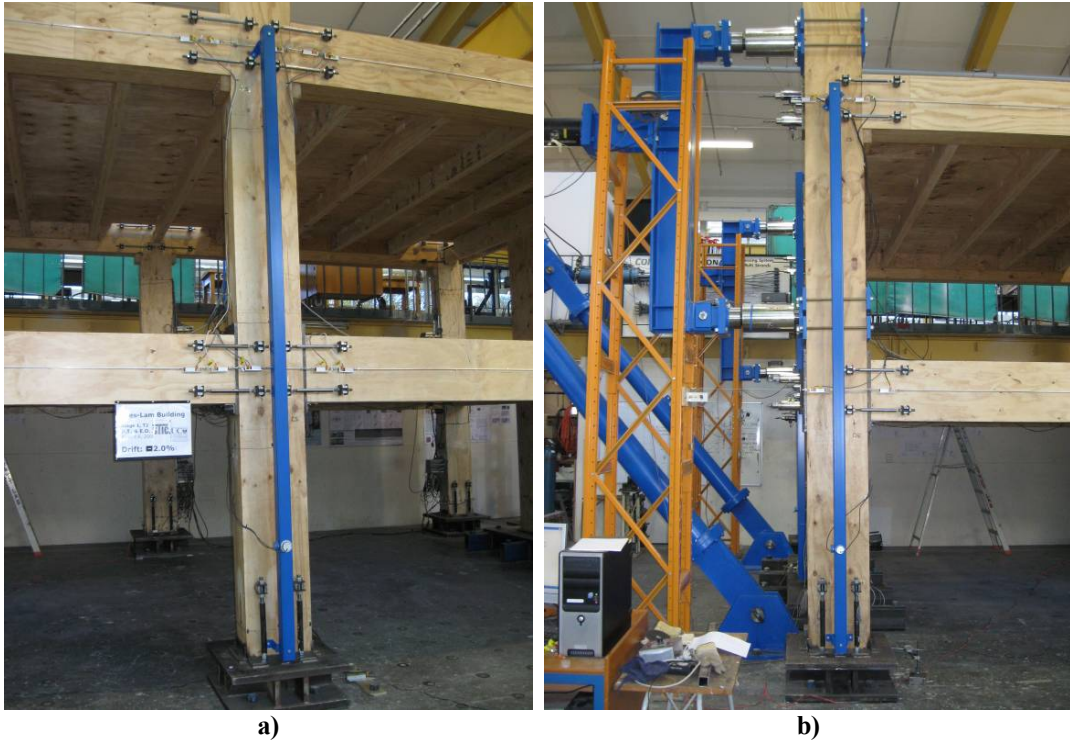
Columns at negative 2% Drift a) S column b) SW column
